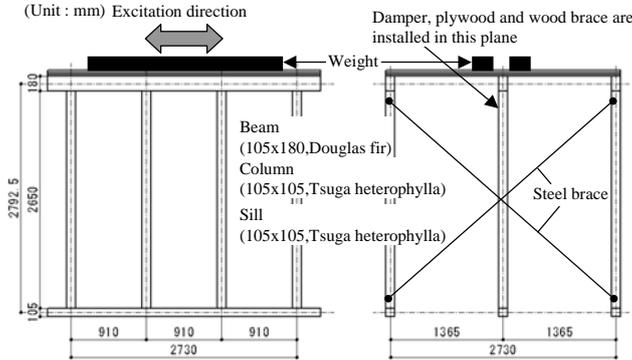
Elevations of the Three Wood Frames for Shaking Table Tests
